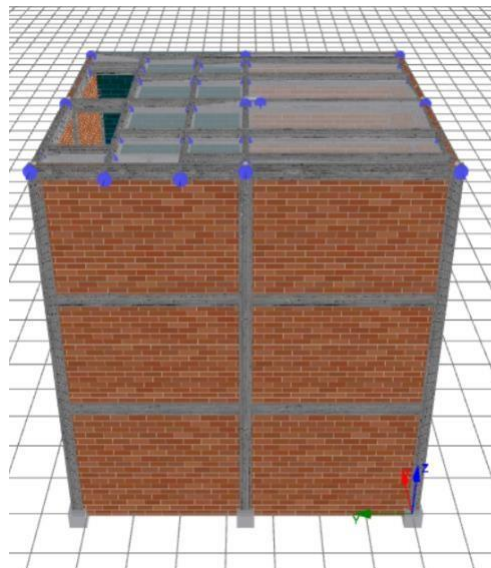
3D modeling of shophouse building structure with walls (model 2) using Seismostruct Software (Side View)
